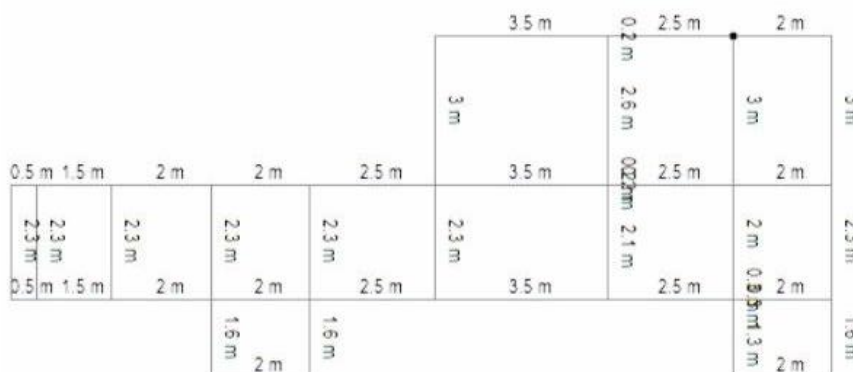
Plan Of Existing Old Heritage Cum Timber Lime Structure
